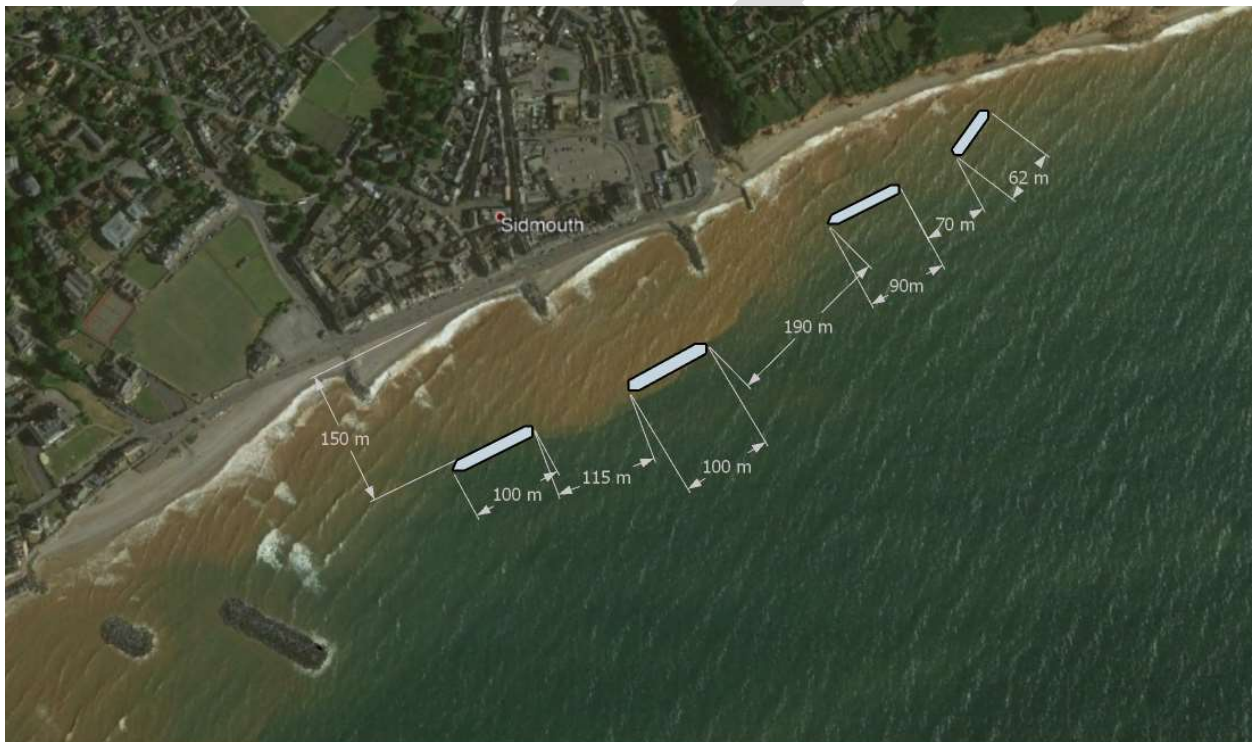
Sketch of Layout 3 with breakwaters located 150m offshore.
